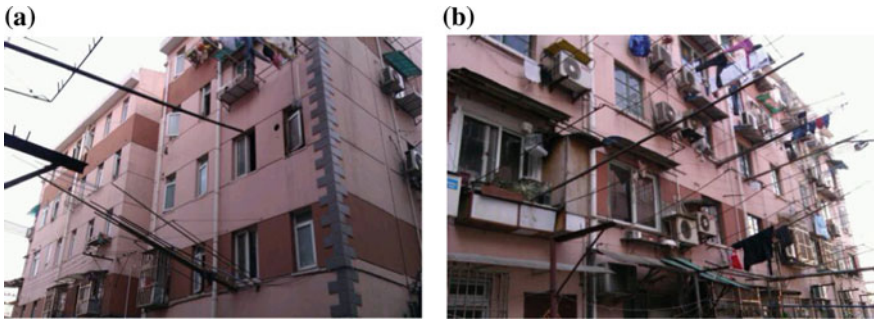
Test building photographs: a north elevation, b south elevation
